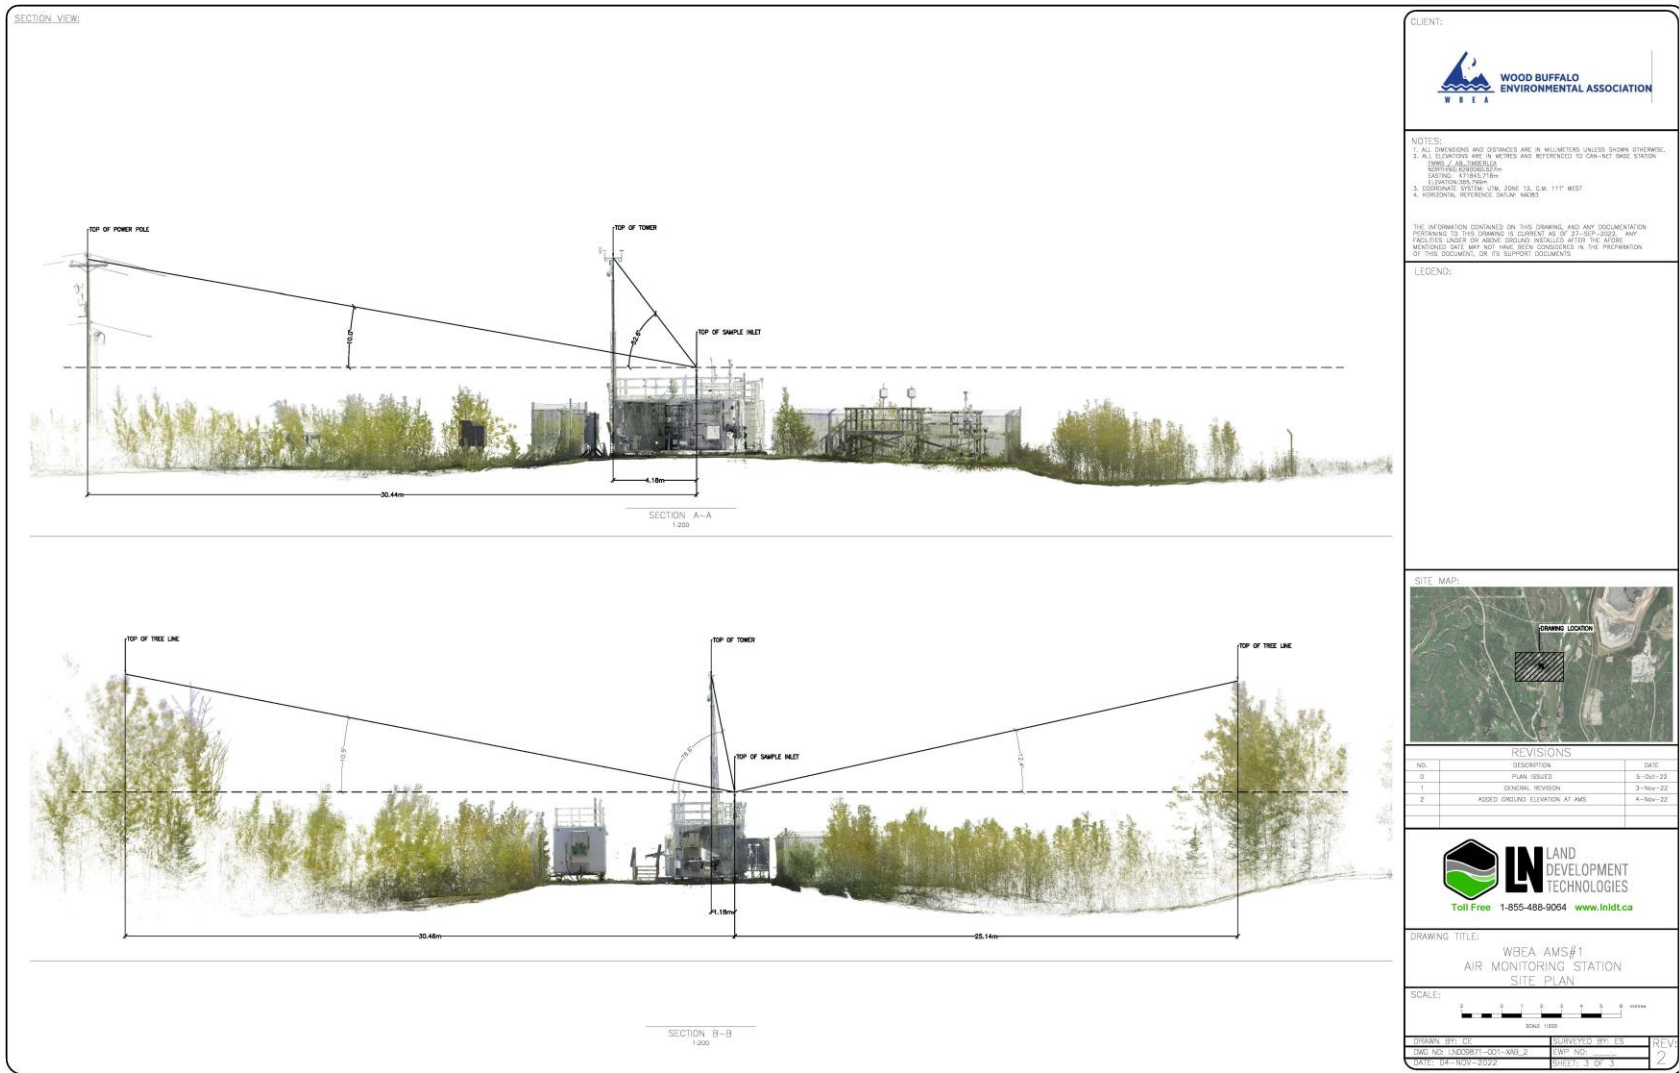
Cross-Section Elevation Drawing for AMS 1
